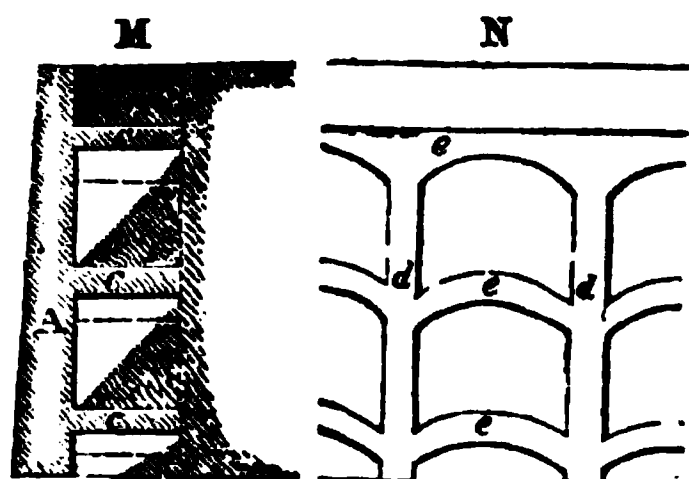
Represents a section M and an elevation N of a wall and relieving arches in three tiers.
